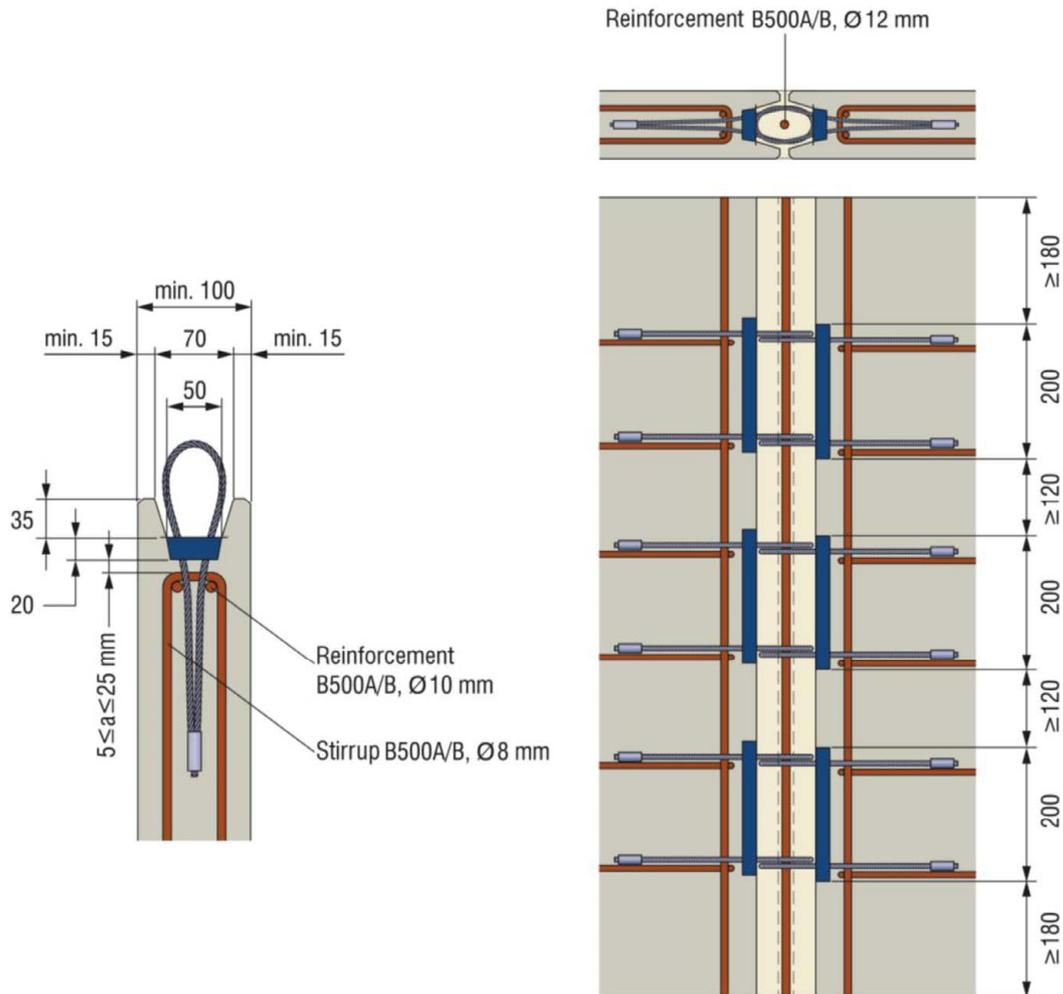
Geometry, reinforcement (Detail precast element A and B)
